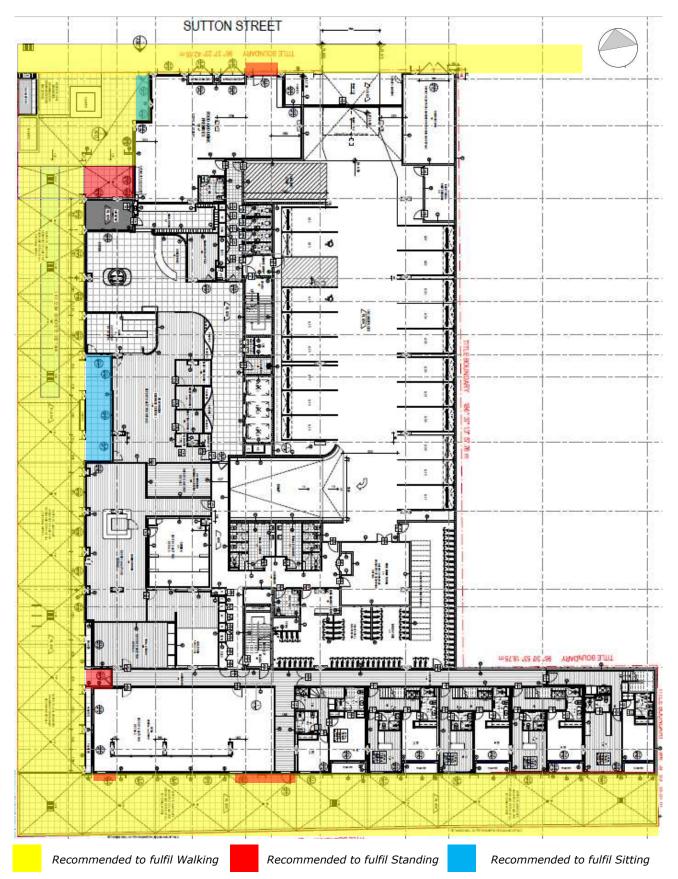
Ground level plan of the proposed development with the recommended wind criteria overlaid.
